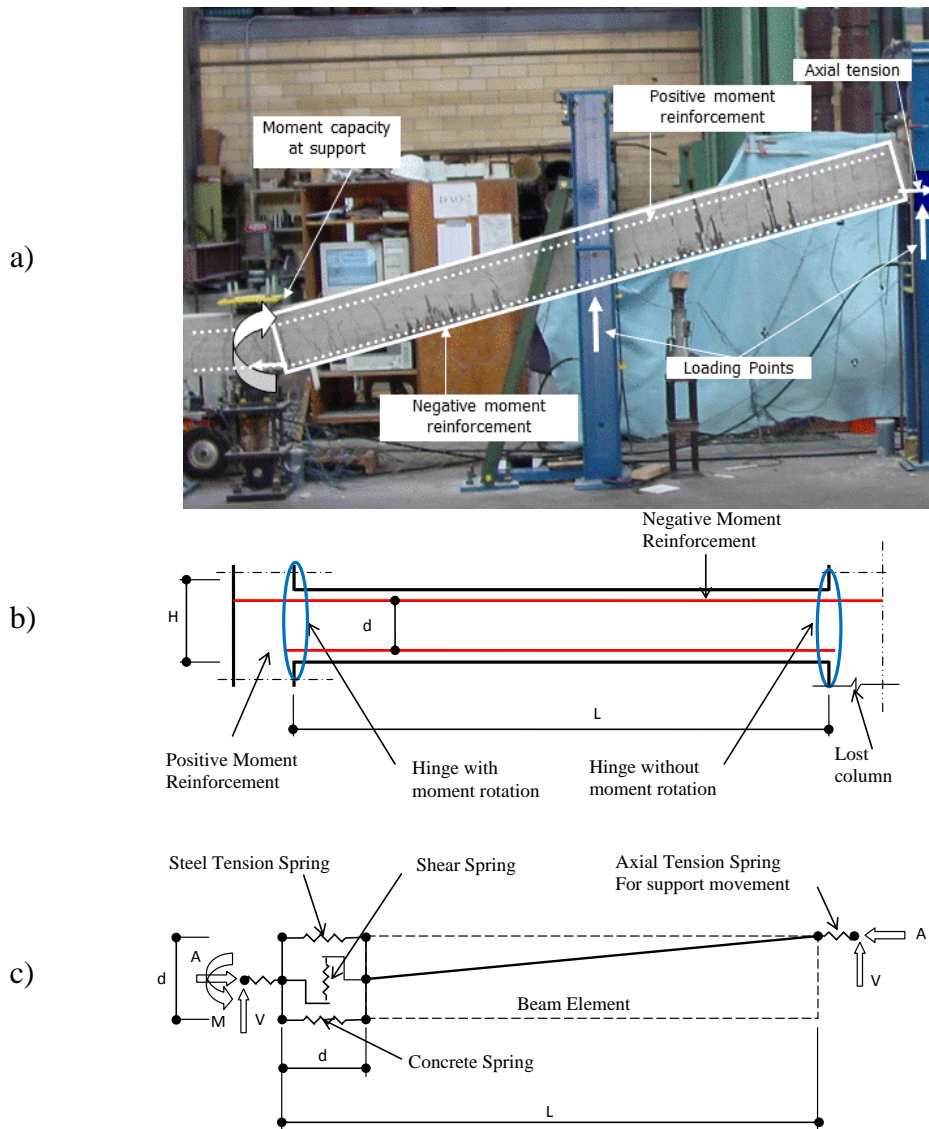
a. Reinforced concrete beam with continuous reinforcement (Orton 2007).
